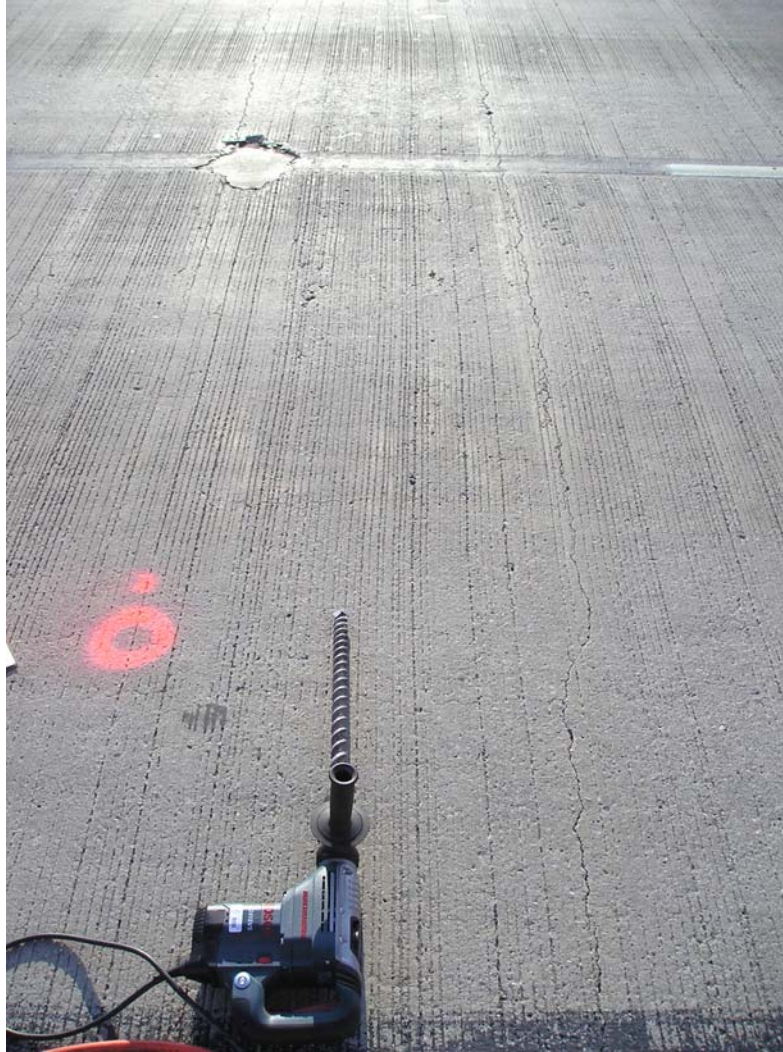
Transverse cracking with efflorescence on bridge C-693.
